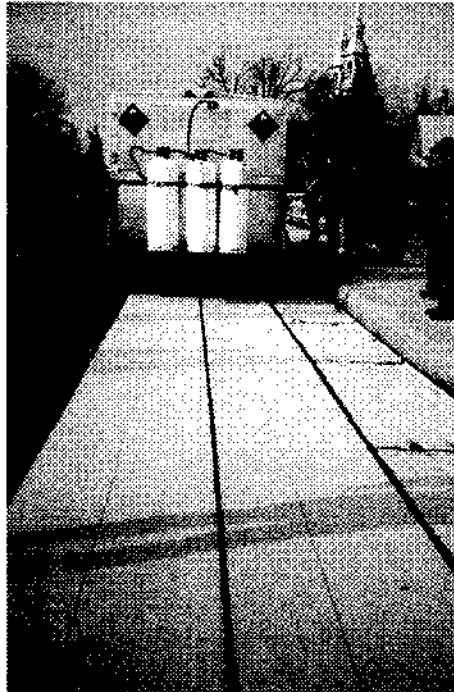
The machine unrolls, welds and presses down on the membrane in a single pass
